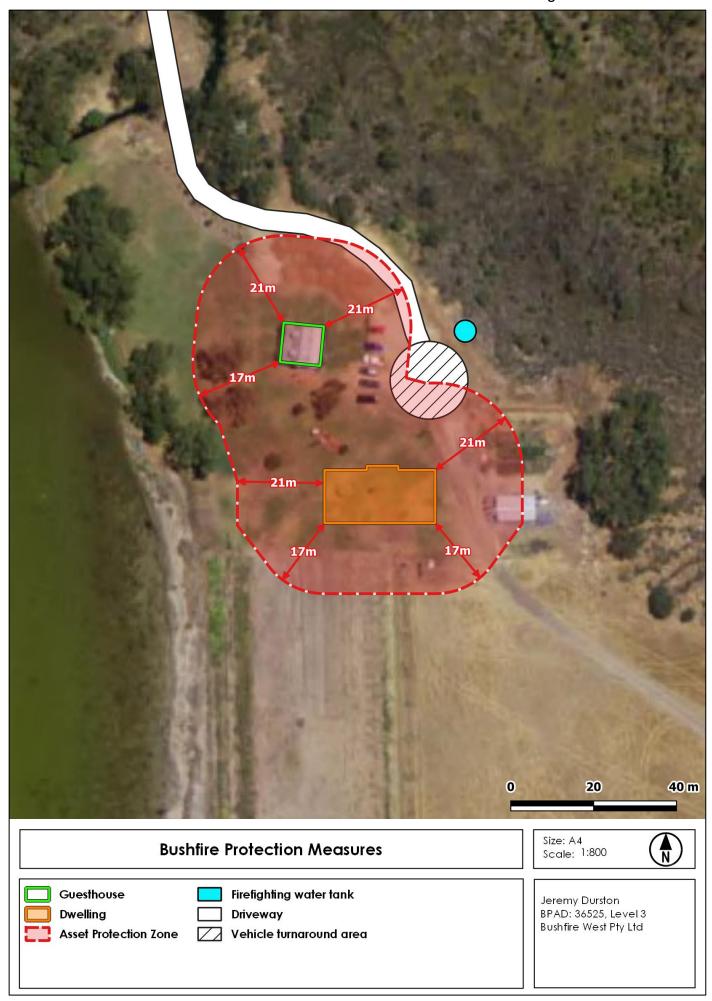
Bushfire Protection Measures – detailed view of Guesthouse & Dwelling area
